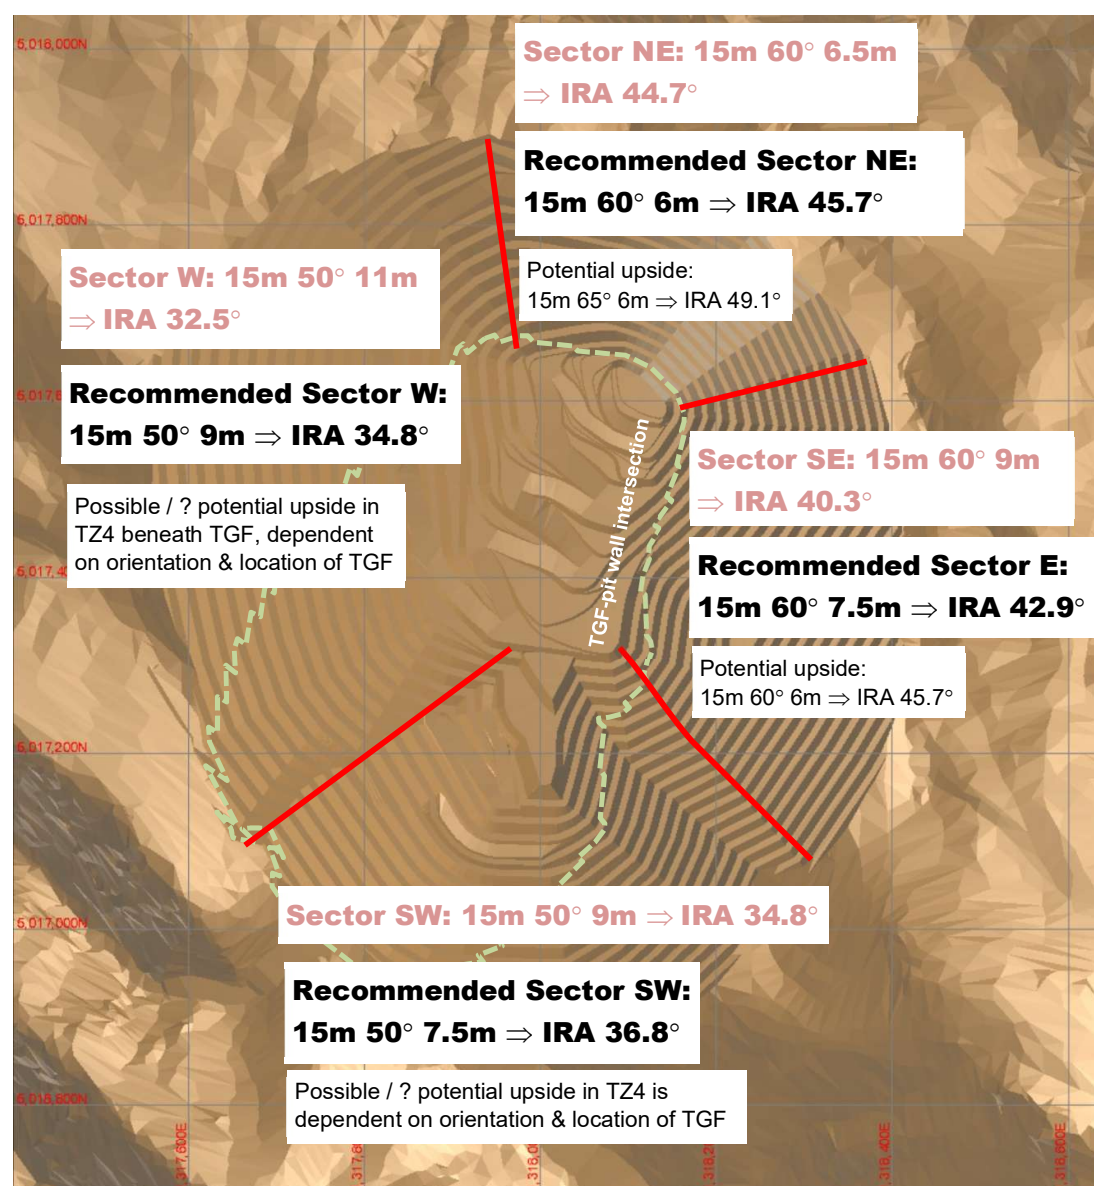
RAS recommended open pit wall design parameters (on Phase 7 pit configuration)
